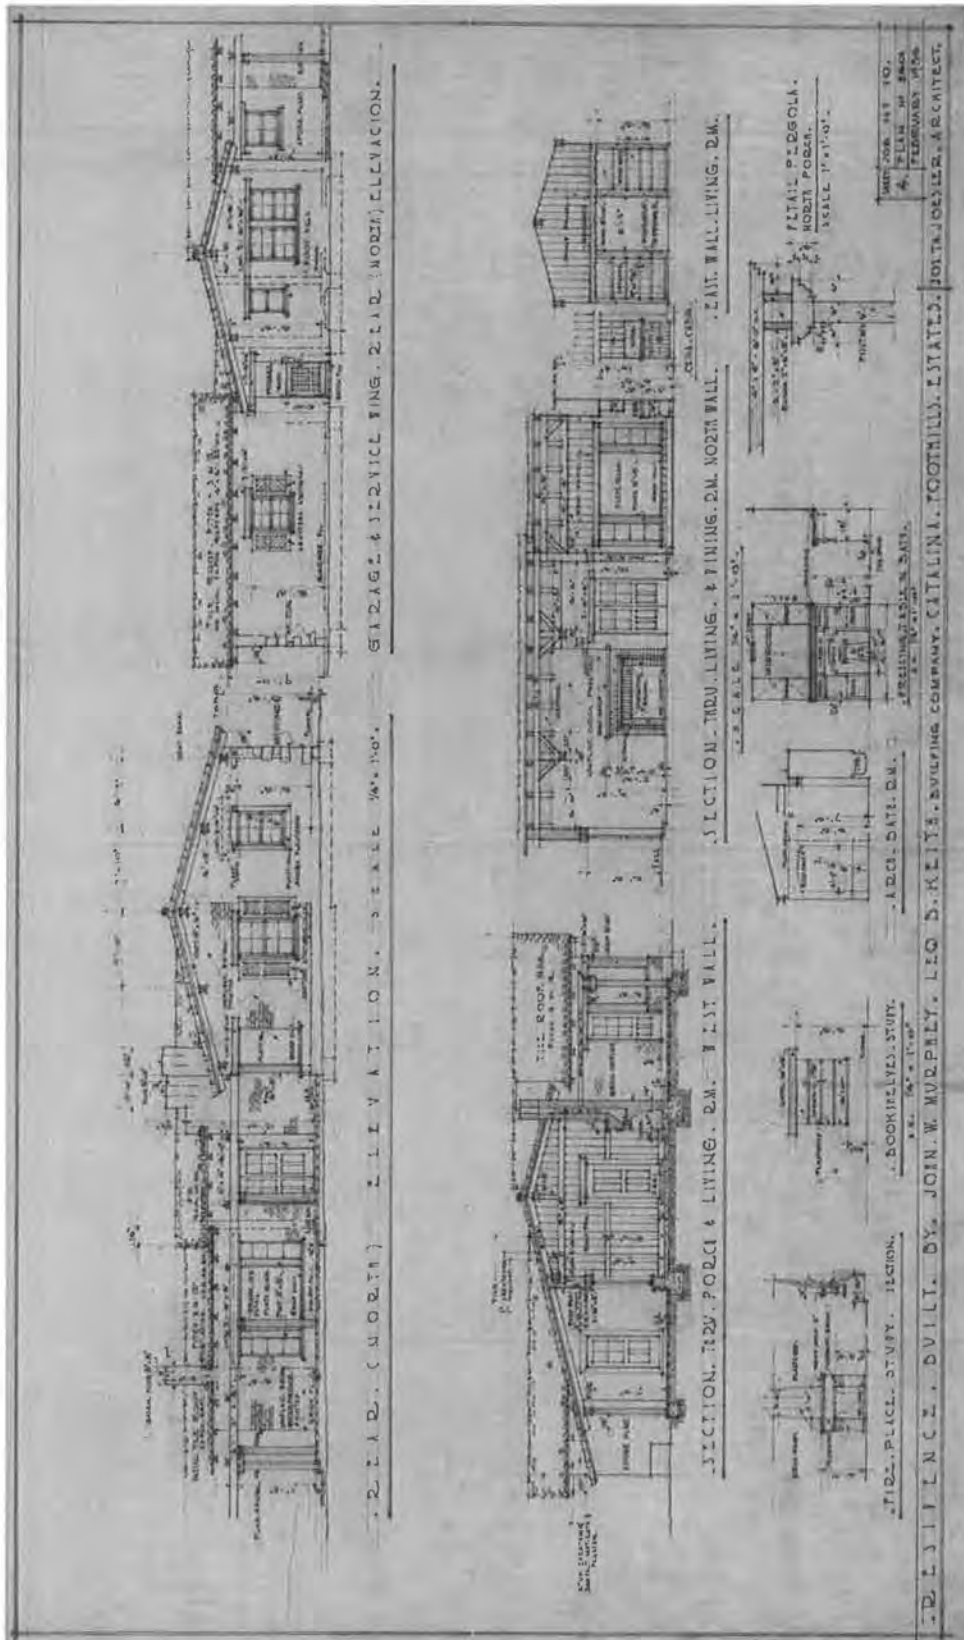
Joesler Elevation and Section Plan 1936 North elevations - interior sections, Arizona Architectural Archive
